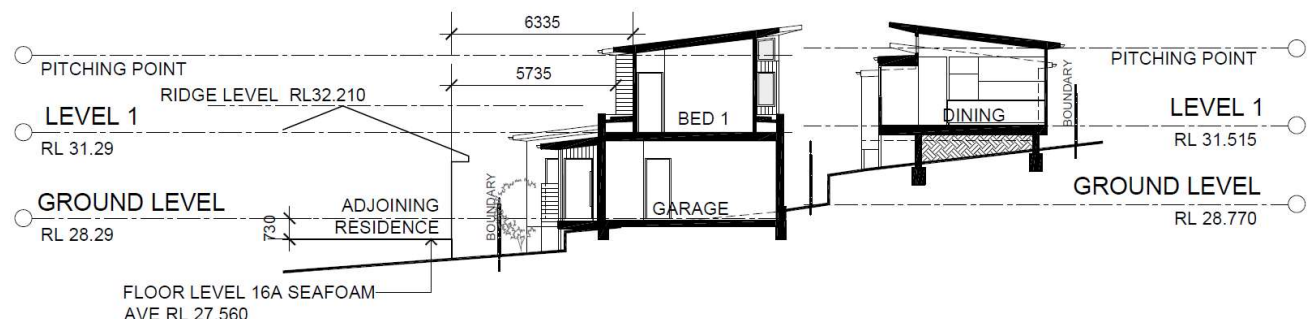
Site Cross Section – 16a Seafoam Avenue indicated as ‘Adjoining residence’.
